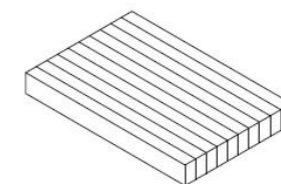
Kaufmann, Krötsch, and Winter (2018) Dowel laminated
